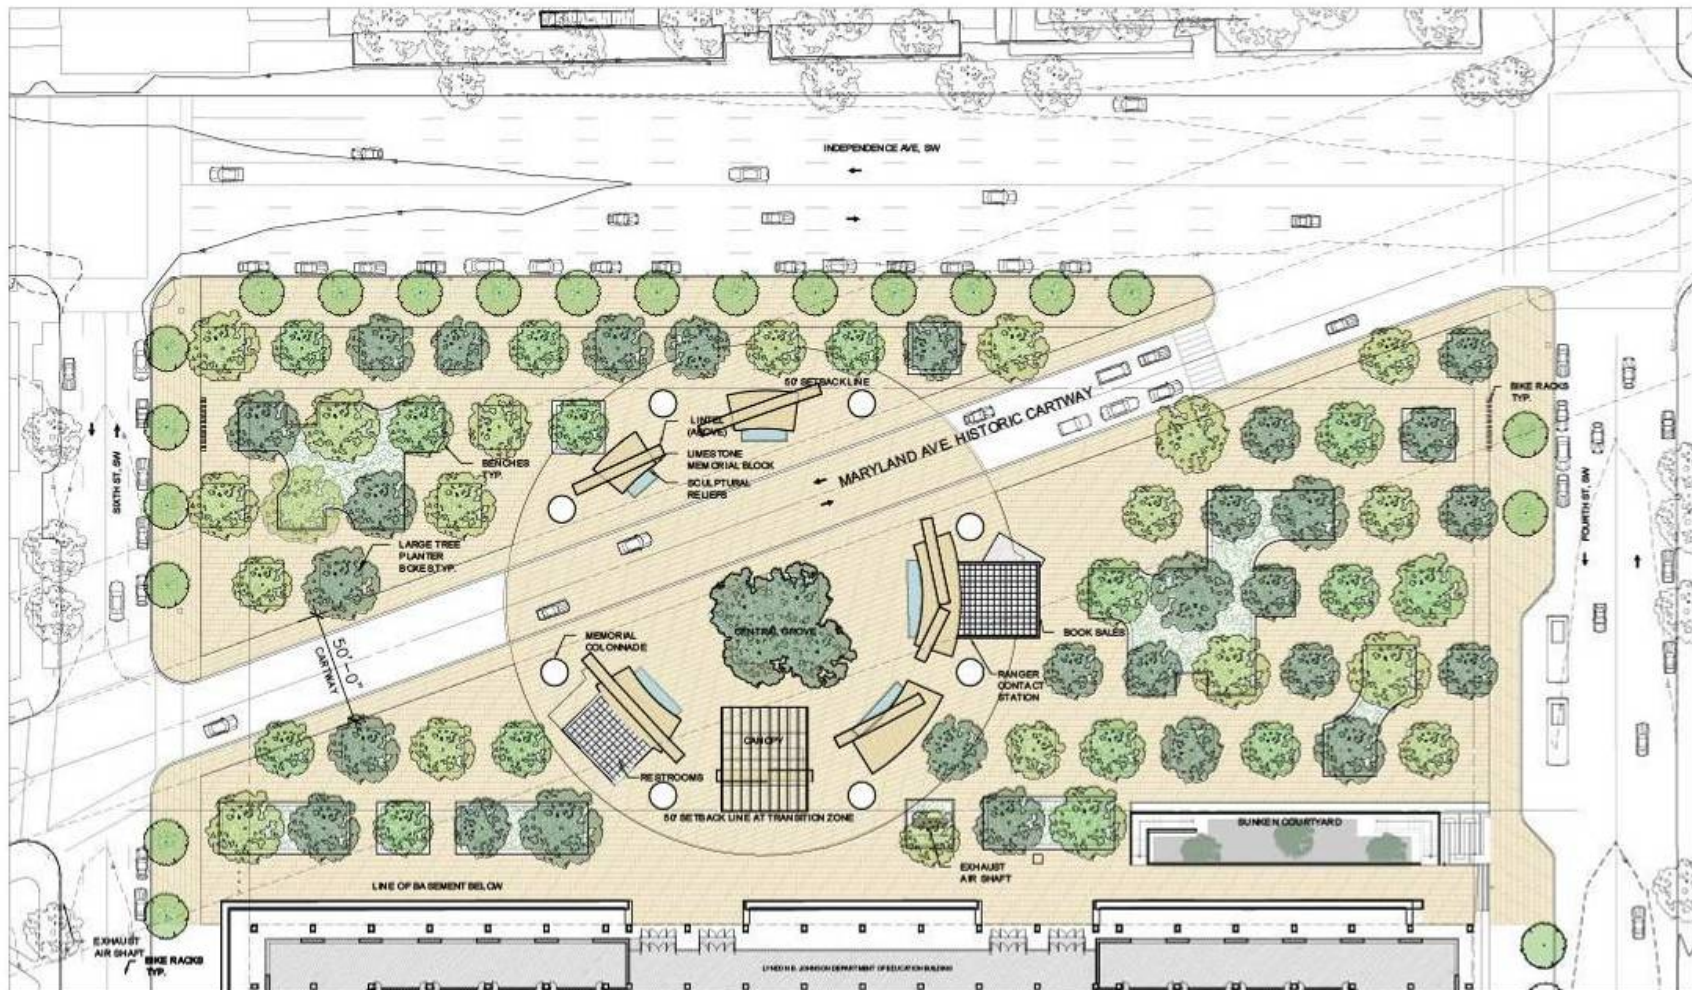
Alternative 1 (Maryland Roadway) site plan
